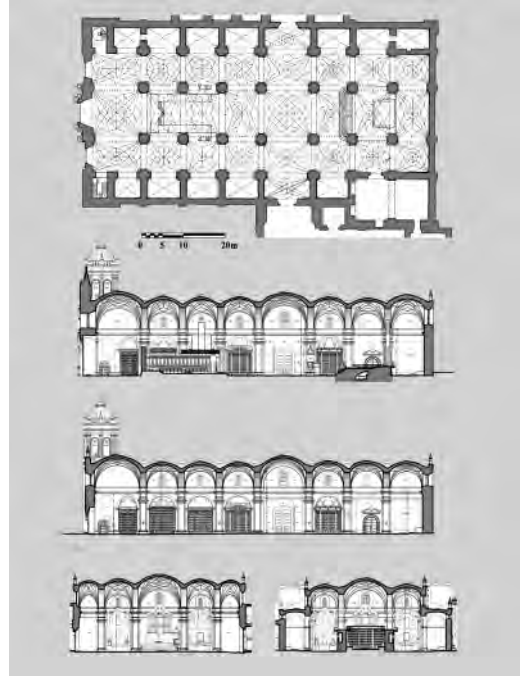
Cathedral of Cusco. Architectural survey: floor plan, longitudinal and transverse sections.
